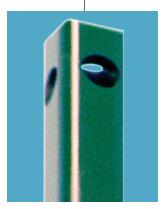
shows drive tube damage resulting from poor wrench alignment during installation of anchors.
